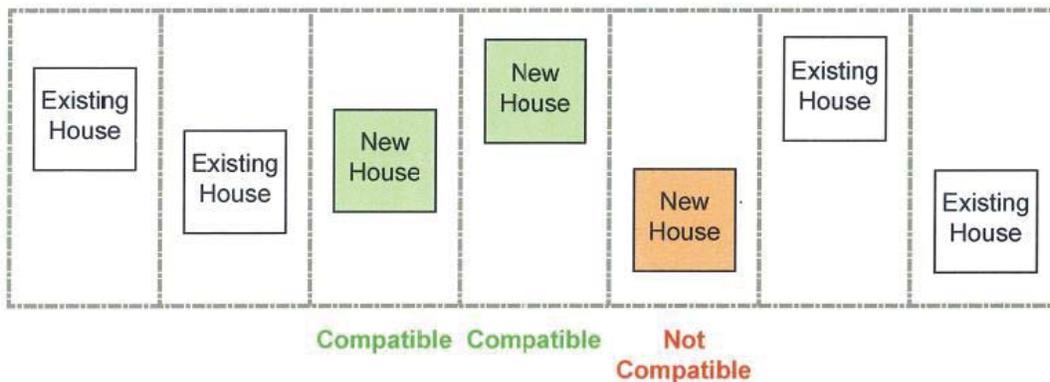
In neighborhoods where existing homes have varied setbacks, the siting of new construction should be equal to or greater than the average setback of adjacent homes.
